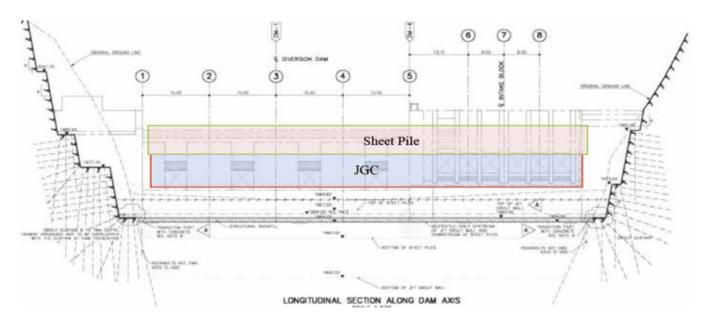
Dam/Intake axis: X-Section showing Sheet Pile and JGC wall
